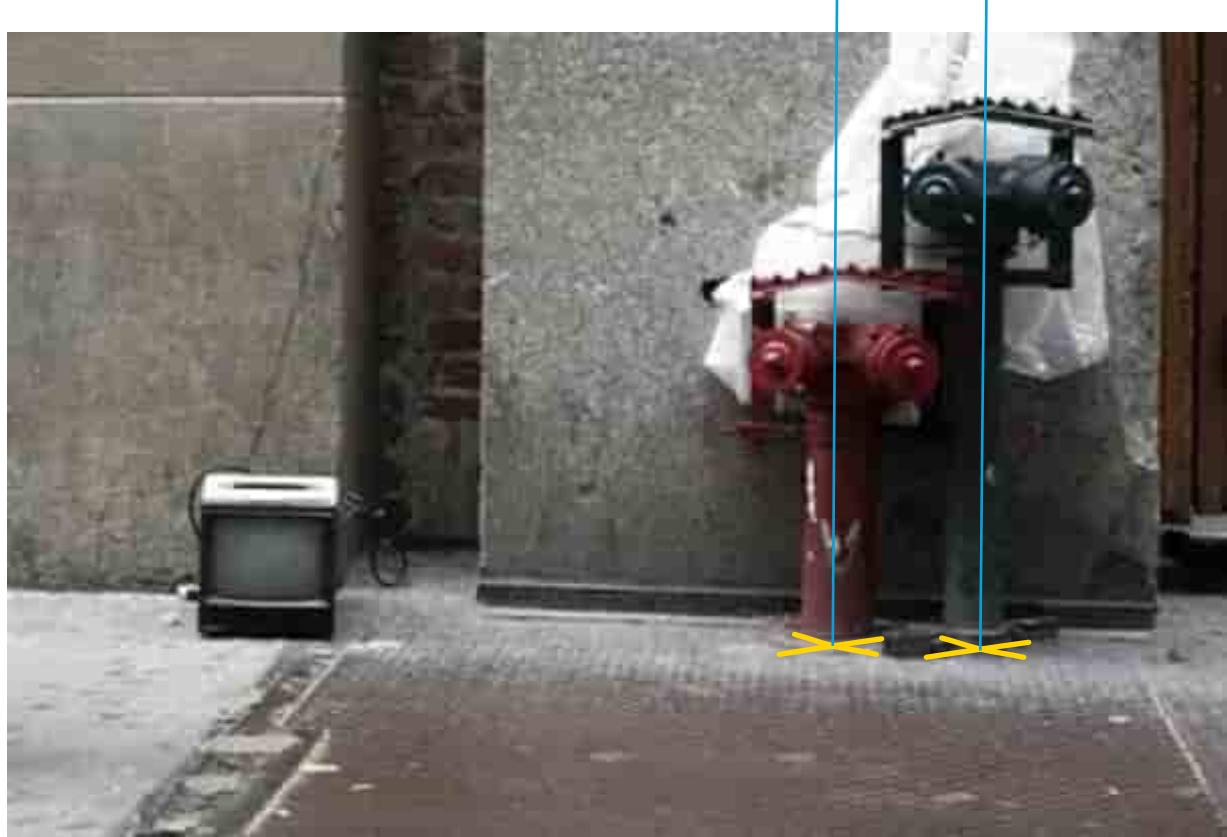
Image showing preferred way of measuring BUILDING HYDRANT
